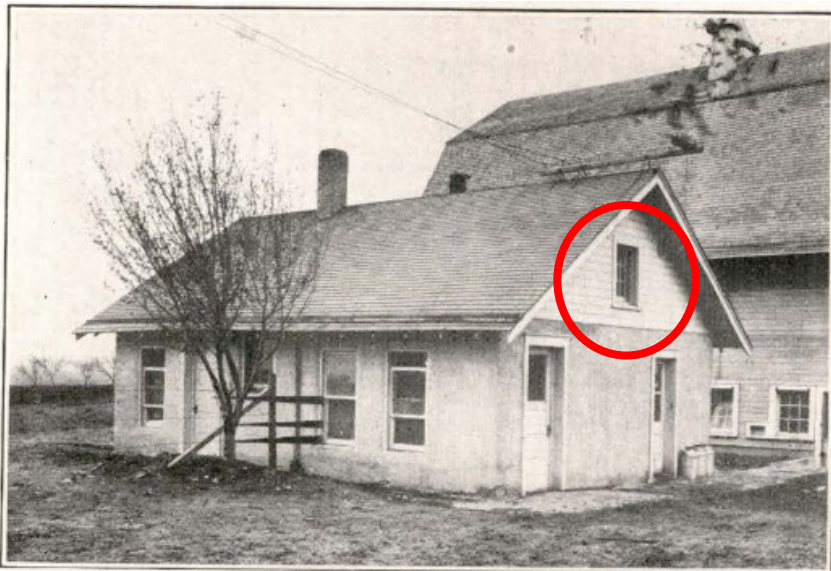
This photo of a traditional milk house shows a window in the gable end.
